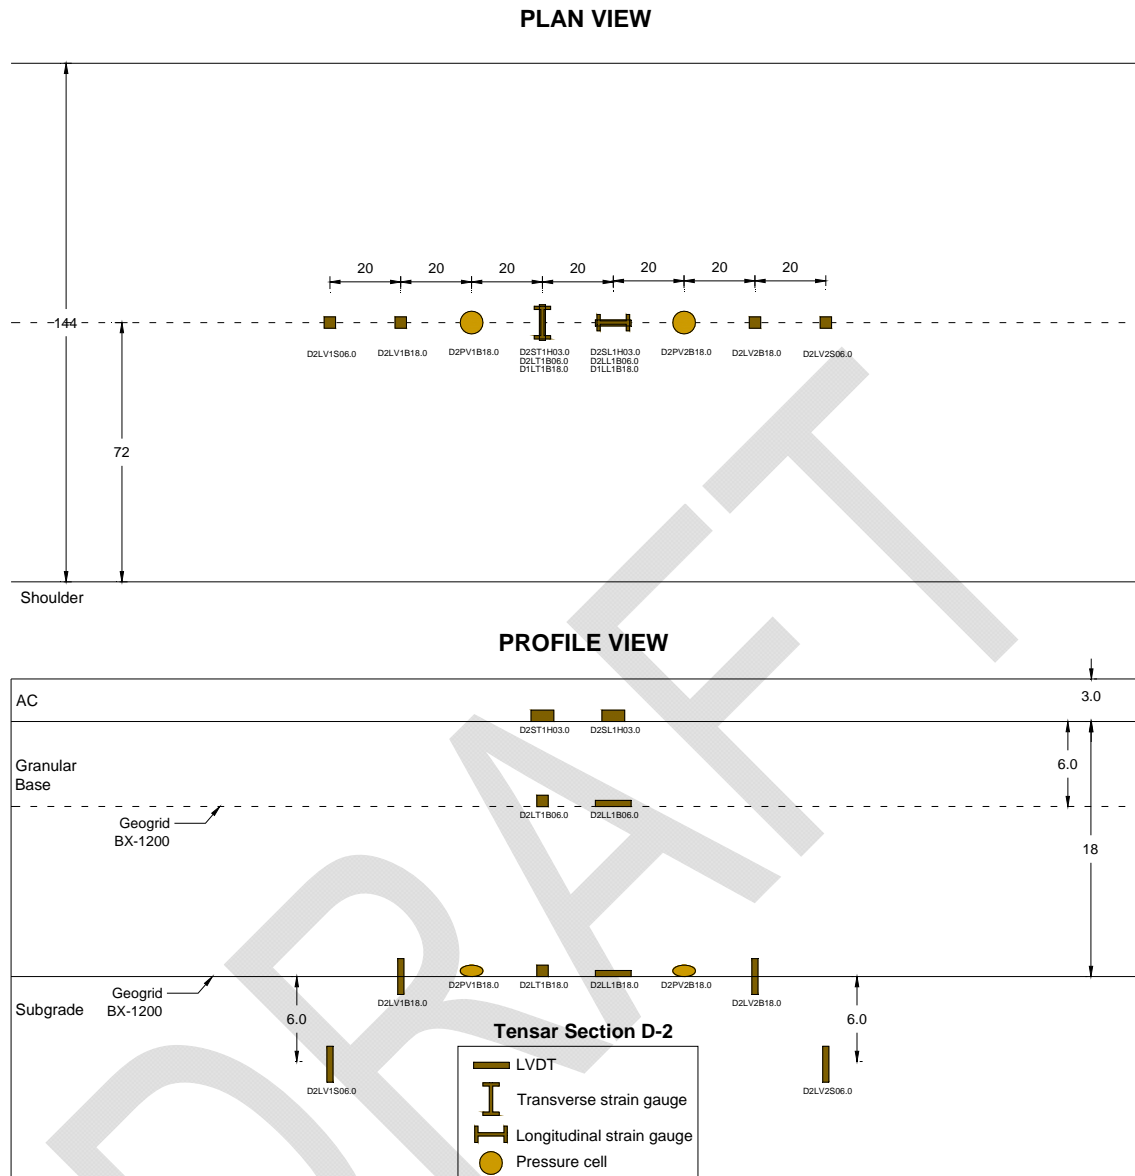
Plan and profile view of pavement structure and instrumentation of thin Section D-2 at ATREL-UIUC
